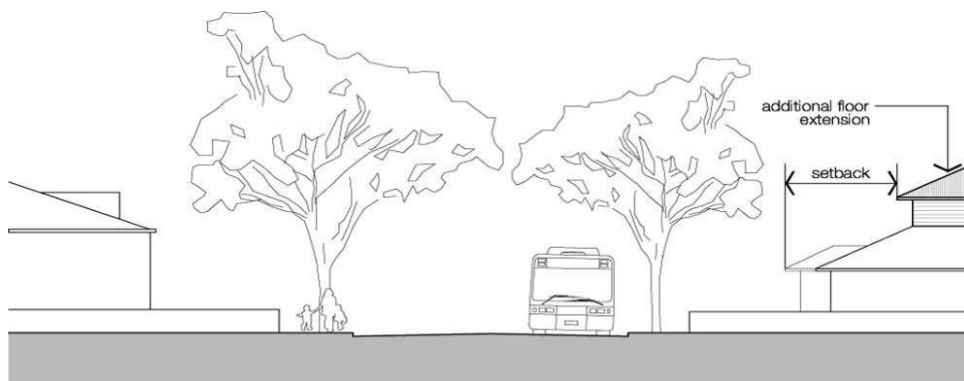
An example of alterations and additions which are sensitively undertaken, and are within the existing envelope. First floor additions are set back in order to minimise the impact upon the street character.
